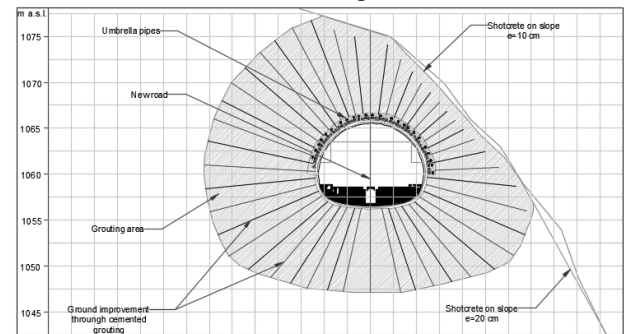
Tunnel 11, Bogota-Villavicencio road
